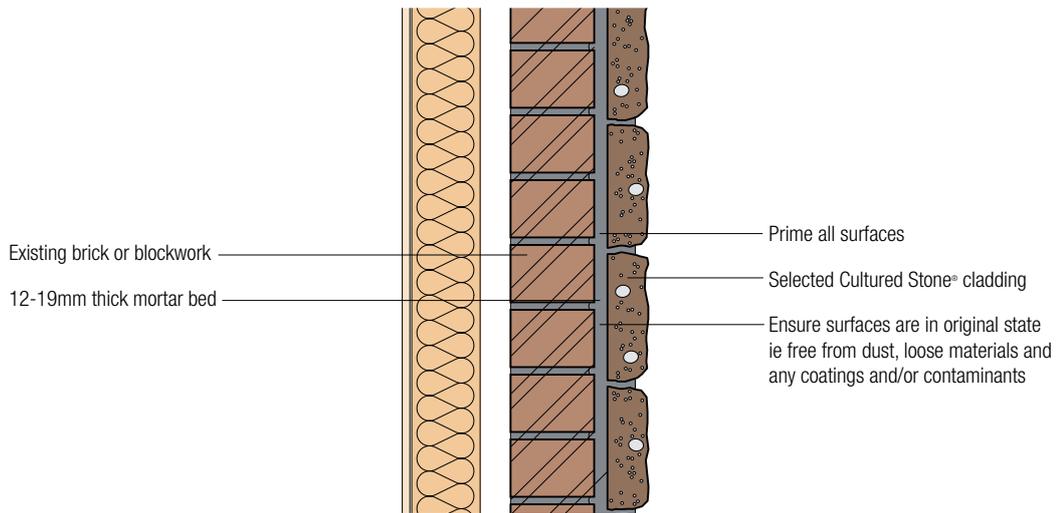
Brick or Block Work Veneer - Section (Dwg # CS-05.02)
